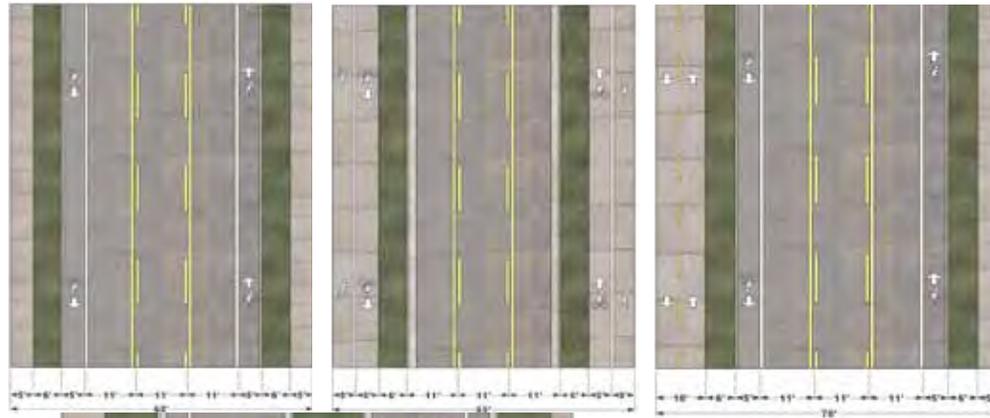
COMPLETE STREET DIMENSIONS AND SECTIONS
